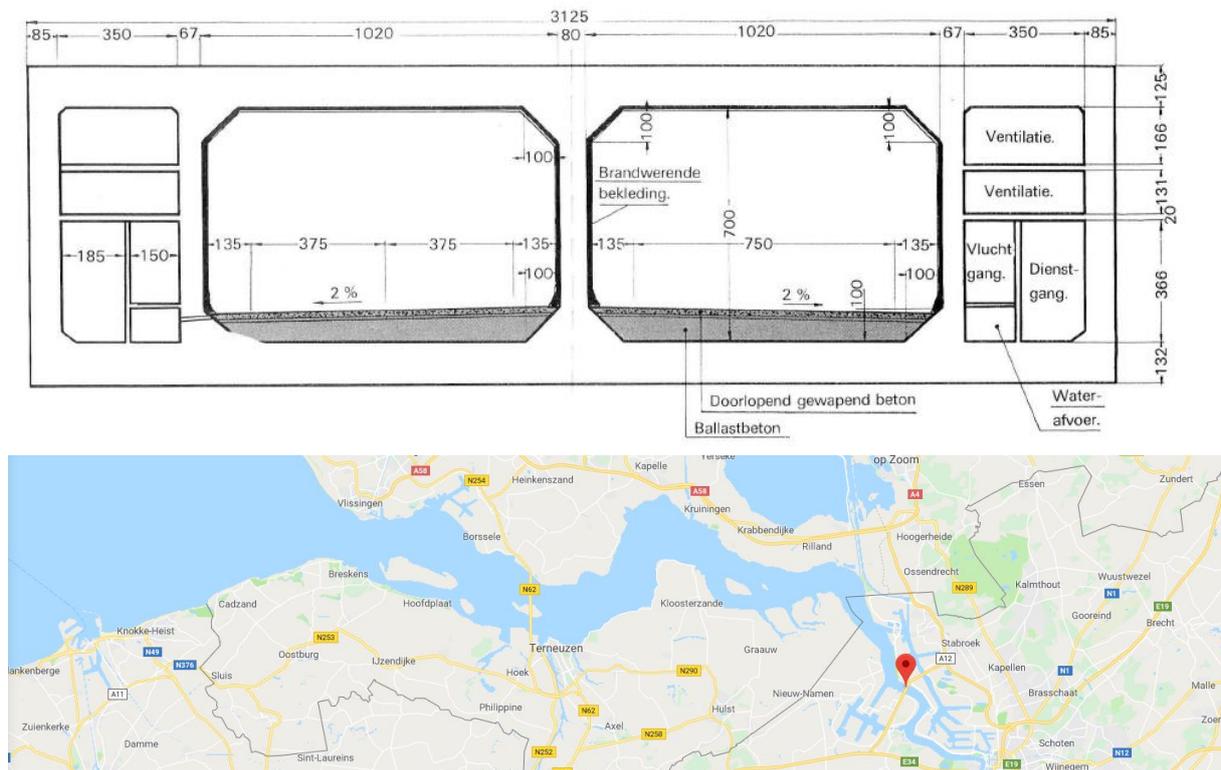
, LIEFKENSHOEK TUNNEL CROSS SECTION AND LOCATION
